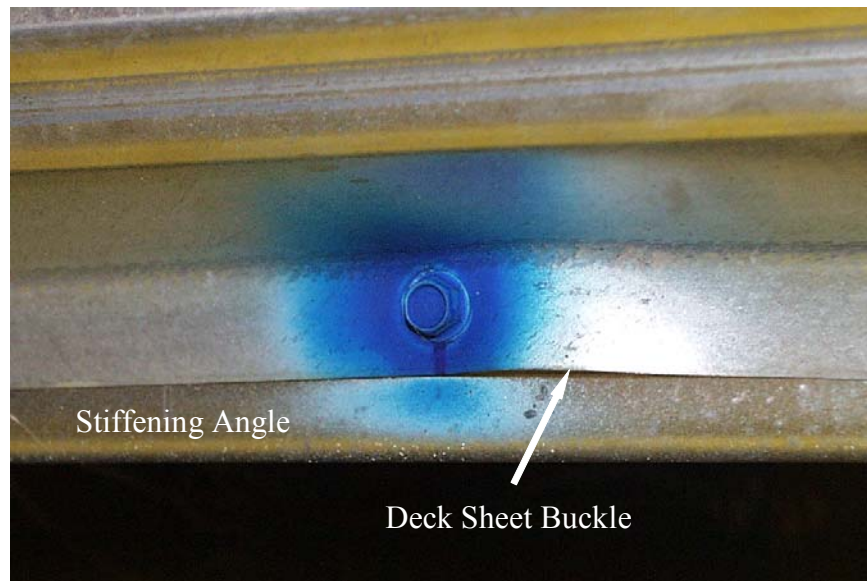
BUCKLING OF DECK AT STITCH FASTENER WITH STIFFENING ANGLE.
